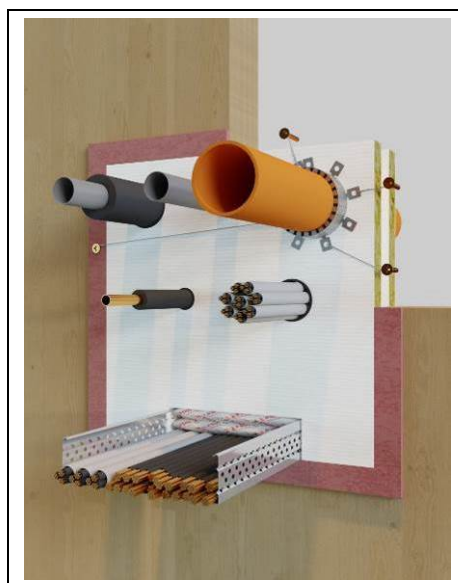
Example of AF PANEL seal in a sandwich panels wall EI 120.
